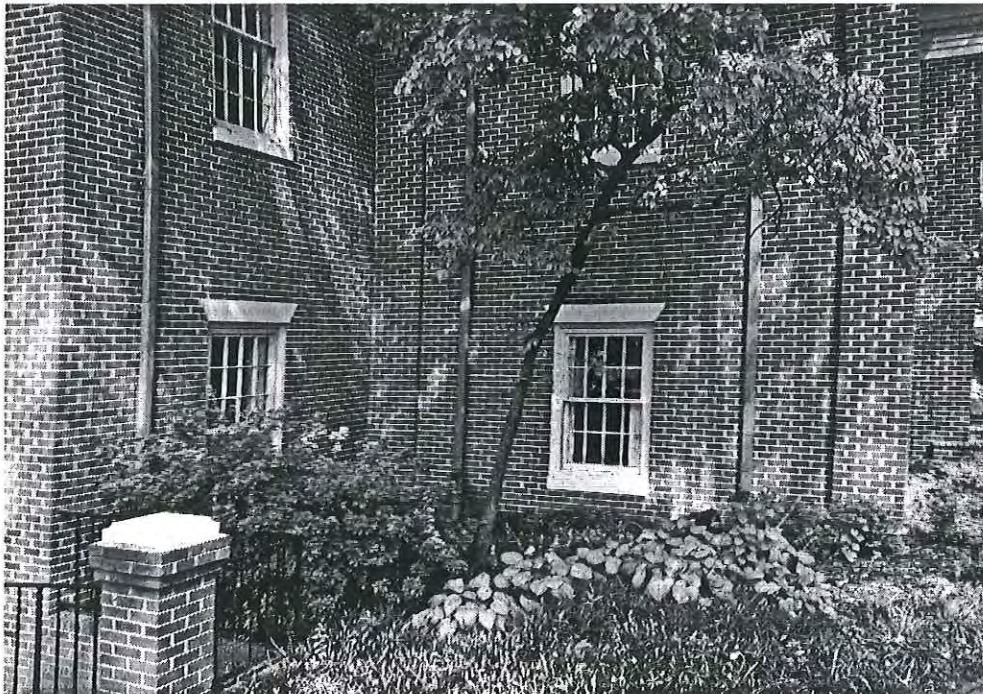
Existing walkway to be replaced. Belk Dining Hall east or left in photo, new Book Store west or right in photo. Note existing mature trees (note 2 in photo) shall be protected and maintained.
